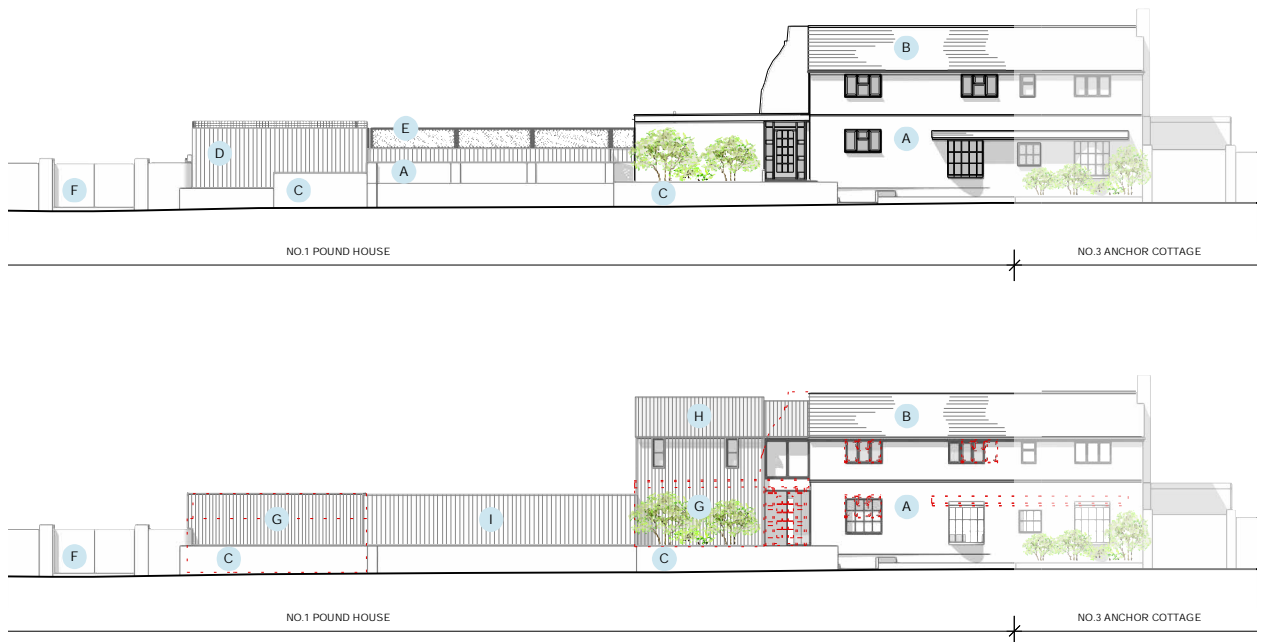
EXISTING & PROPOSED STREET ELEVATION - HORSEFAIR STREET
